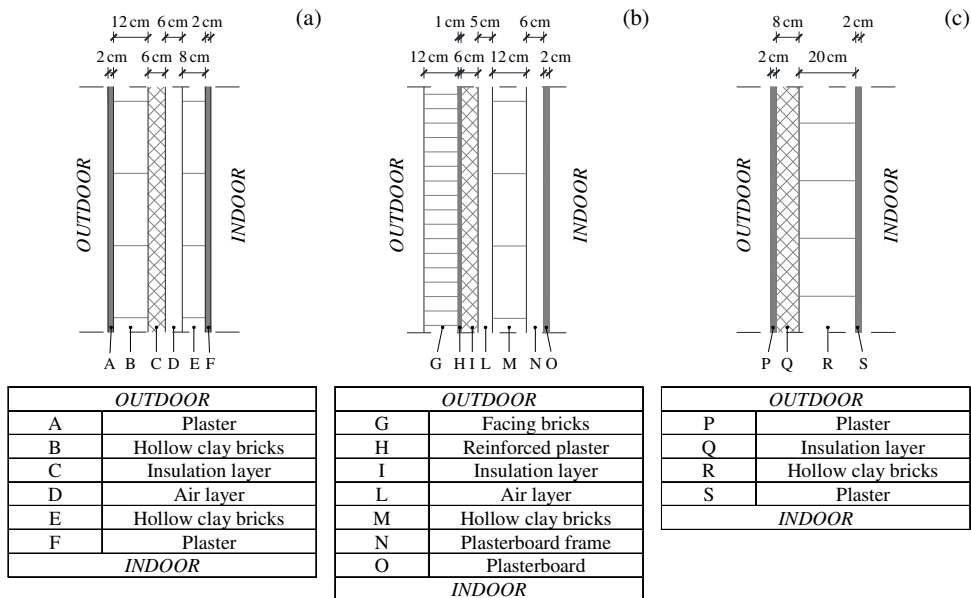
External infill masonry walls typologies: (a) EWF-0, (b) EWF-1, (c) EWF-2.
